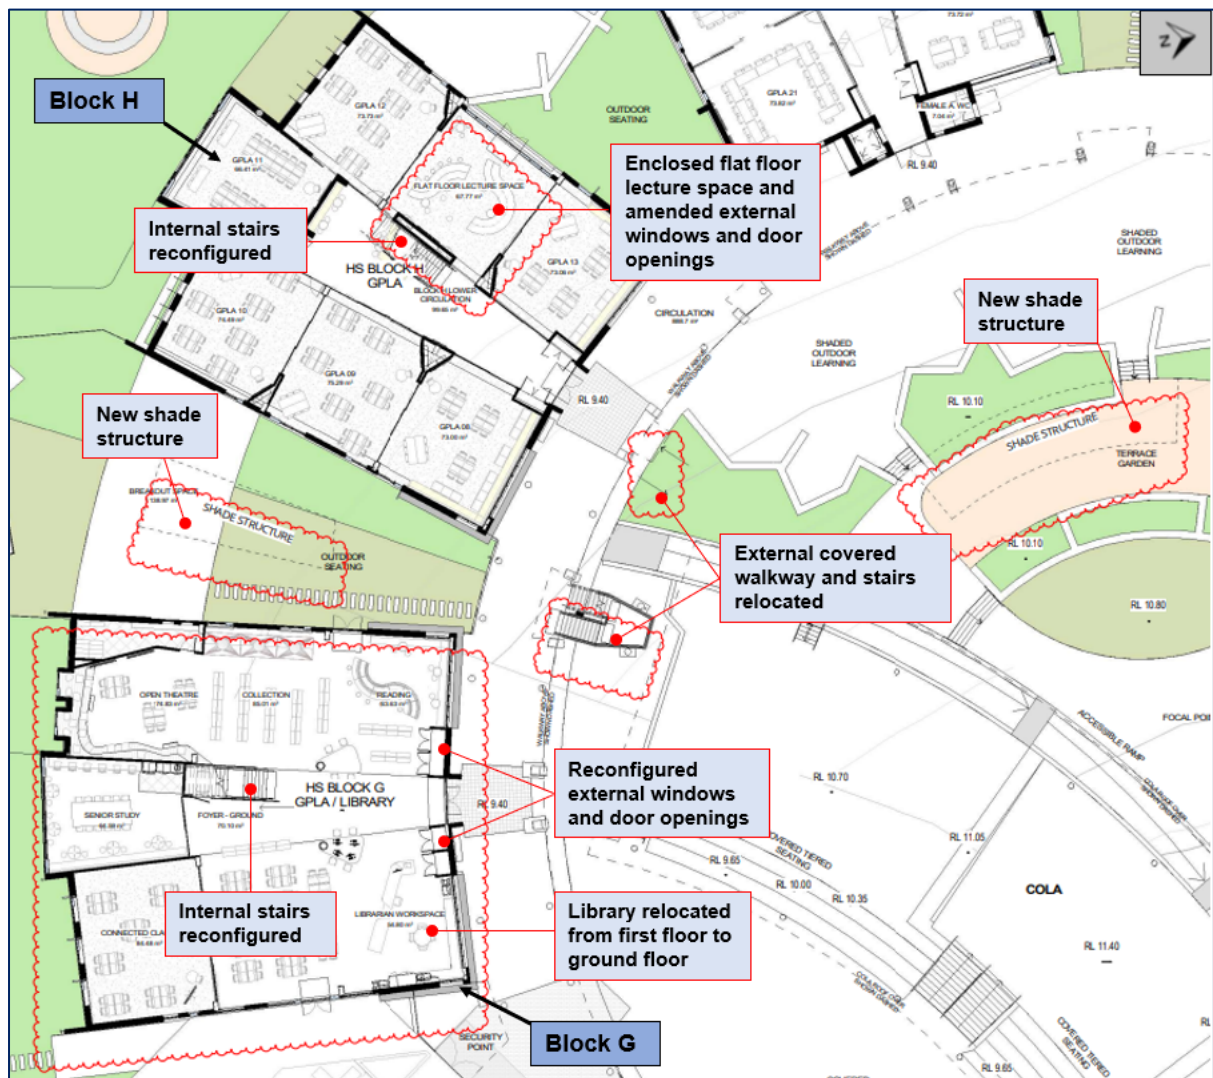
| Proposed amendments to Block G and Block H – ground floor (Source: Applicant's Modification Report)
